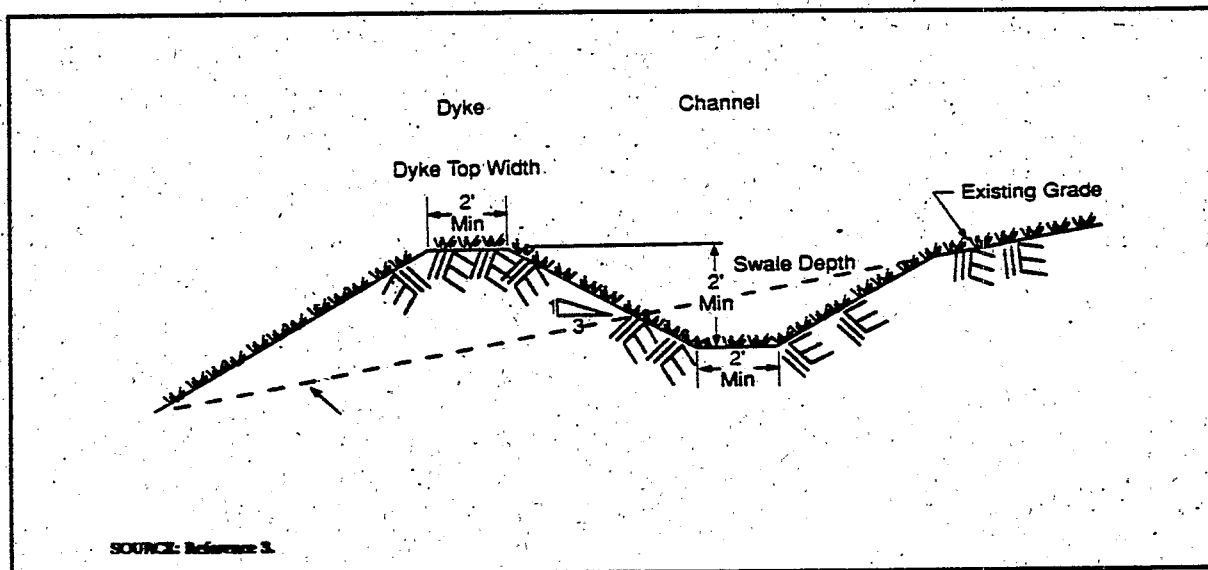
TYPICAL DIVERSION SWALE DETAILS
